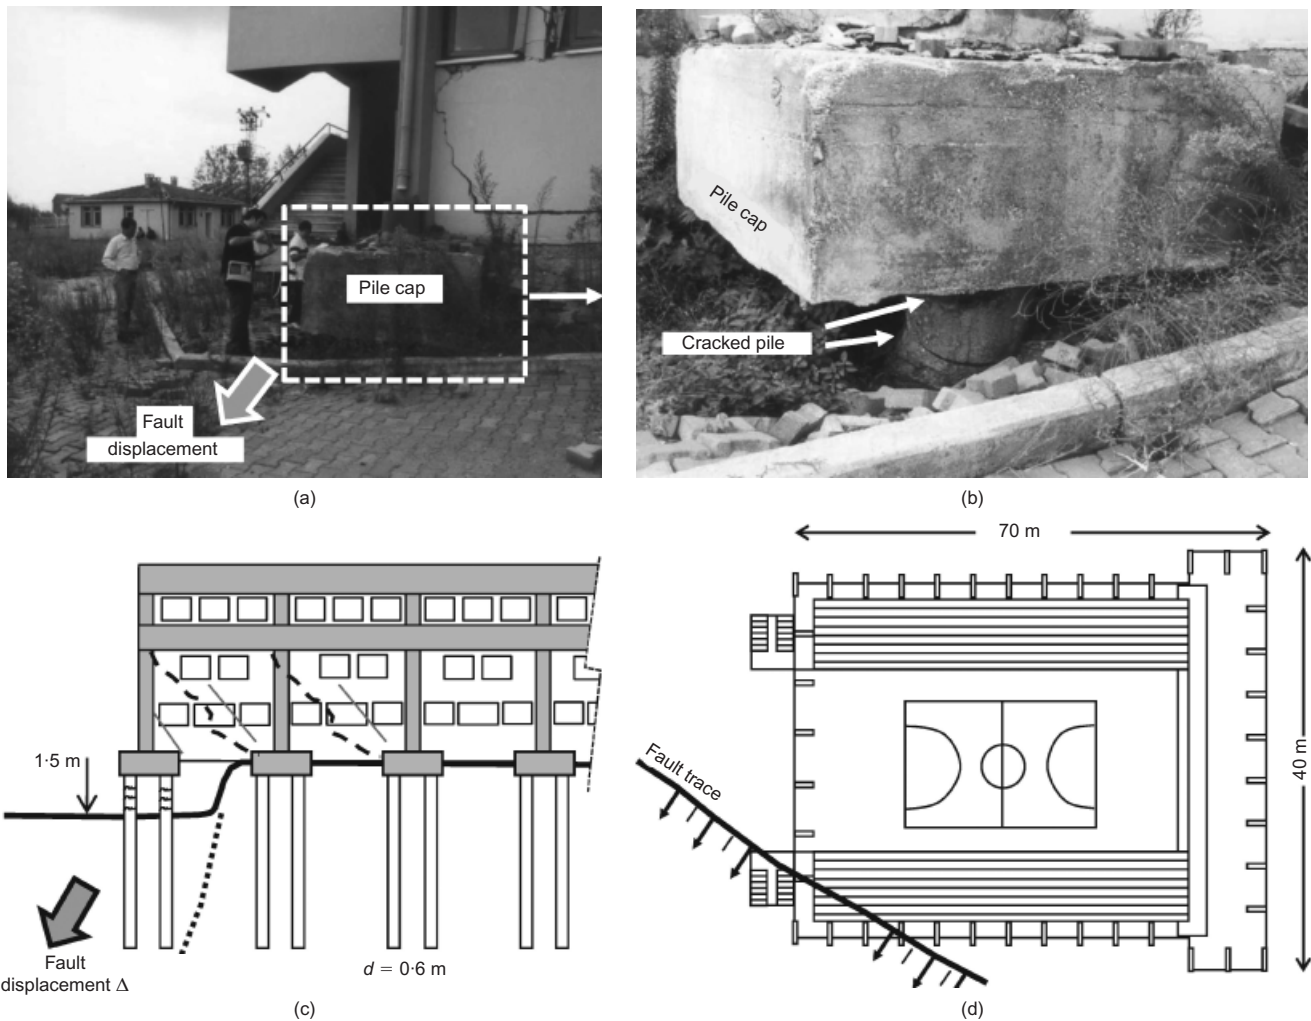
Basketball stadium in Denizevler: (a) photograph of the building’s corner crossed by the fault trace; (b) zoomed view showing the failed piles; (c) schematic cross-section; (d) plan view of the building along with the fault trace
